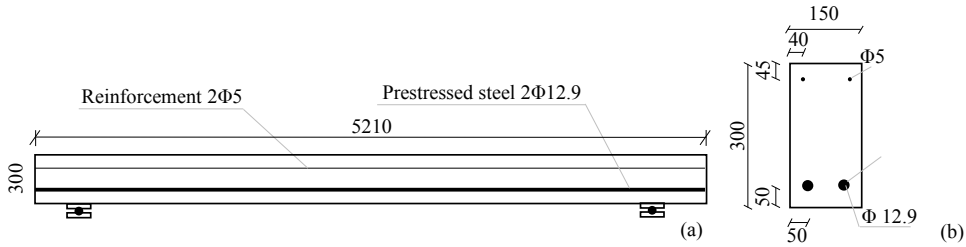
Geometrical features of the beams [in mm]: (a) Longitudinal view and (b) Transversal cross-section.
